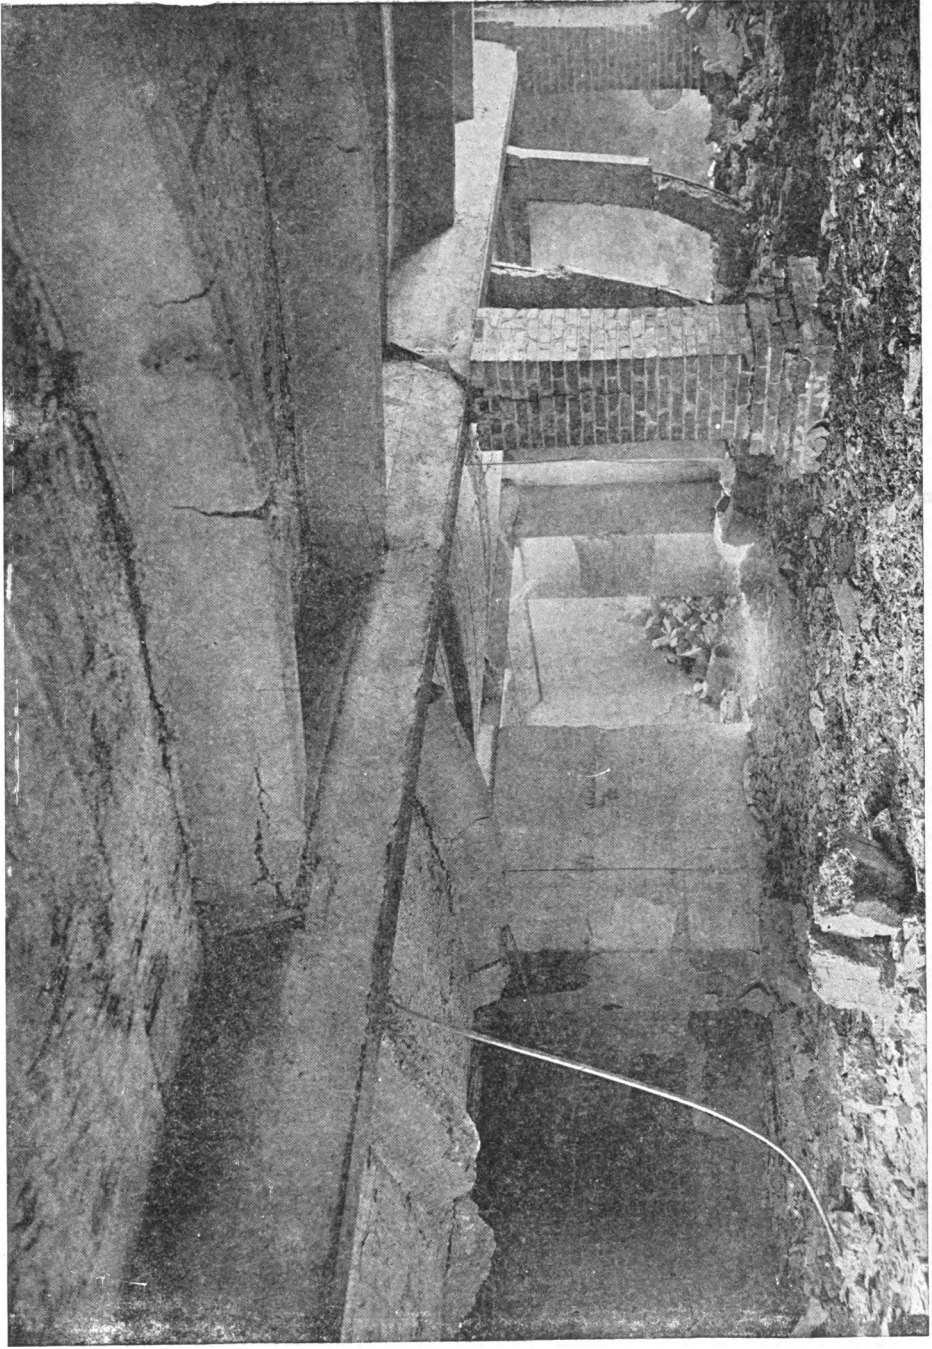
Showing the Effect of Fire Upon Some Reinforced Concrete Construction. The reinforcement too near the surface, became heated, expanded and allowed the whole to deflect. Some of these beams and slabs are deflected as much as 12 and even 18 inches
